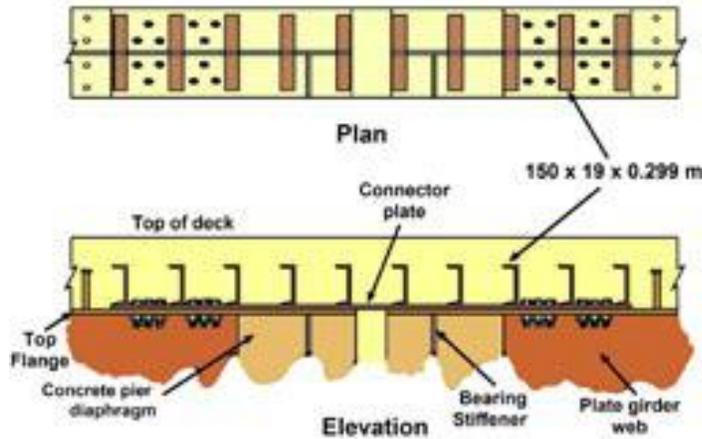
Detail of connection plate on top flanges on NM 187 bridge [5].
